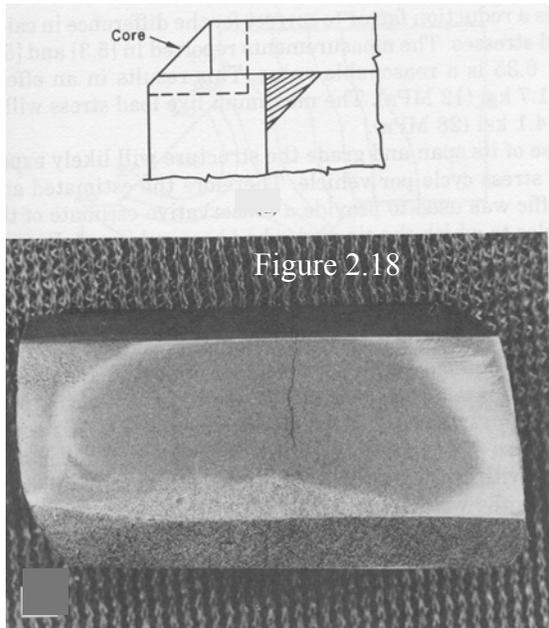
Core of cracked section of corner weld from Gulf Outlet Bridge box girder (Fisher 1984)
